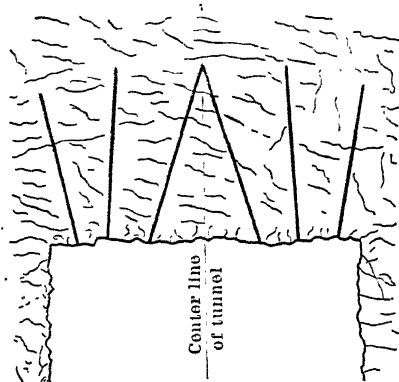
PLAN SHOWING DIRECTION OF HOLES IN TUNNEL-HEADING.
